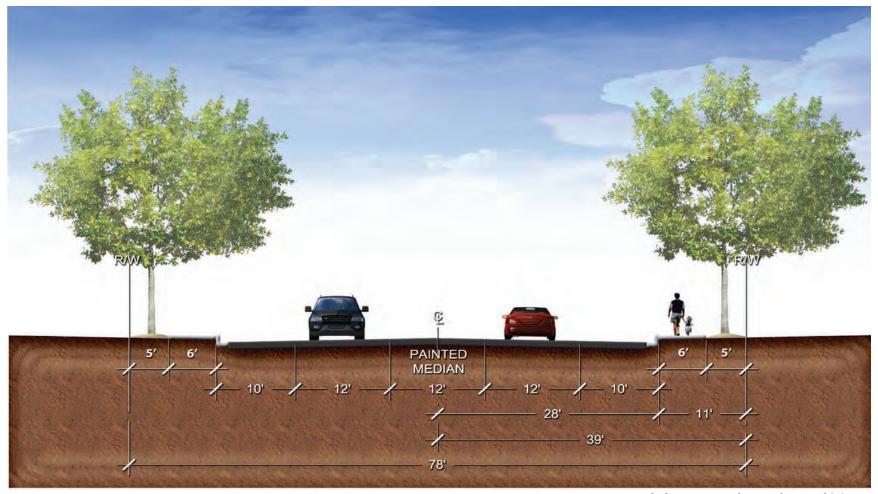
| Themed Road(s) - E Section (78' R.O.W.) 66th Avenue
